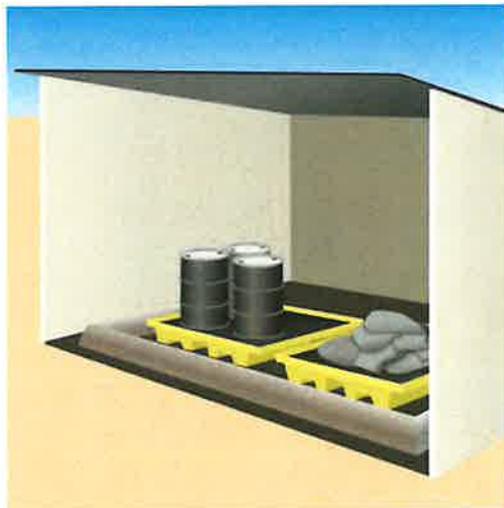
Illustration showing construction materials with secondary containment and overhead cover to prevent stormwater contamination.
